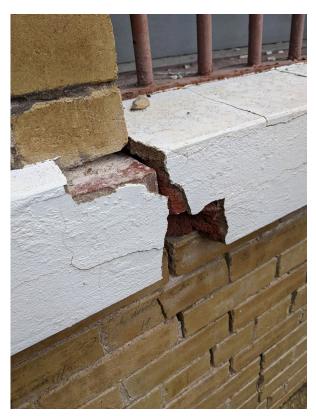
Parge coat to be restored 100%. Masonry restoration includes selective brick repairs/replacement, repointing 100%.
